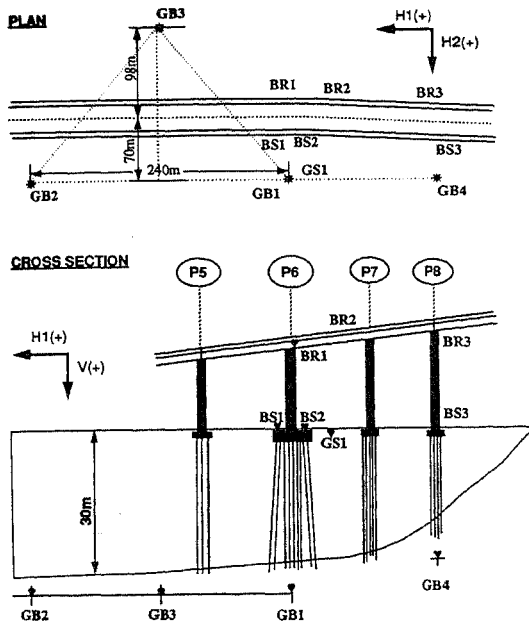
Plan and longitudinal section of the Ohba-Ohashi Bridge near Pier 6, showing the location of the recording instruments GB1, GB2, GB3, GB4, GS1, BS1, BS2 and BR1.
